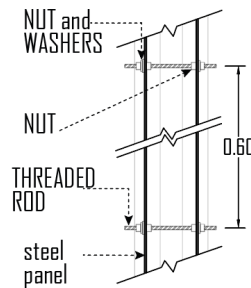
A steel pin threaded rod every 60cm joins the two metal sheets.
